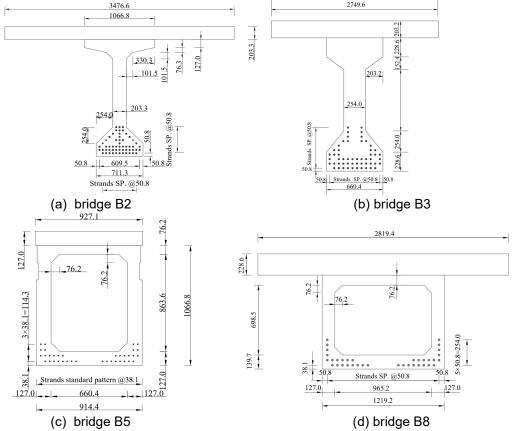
Cross sections of prestressed concrete bridges (dimensions are in mm).
